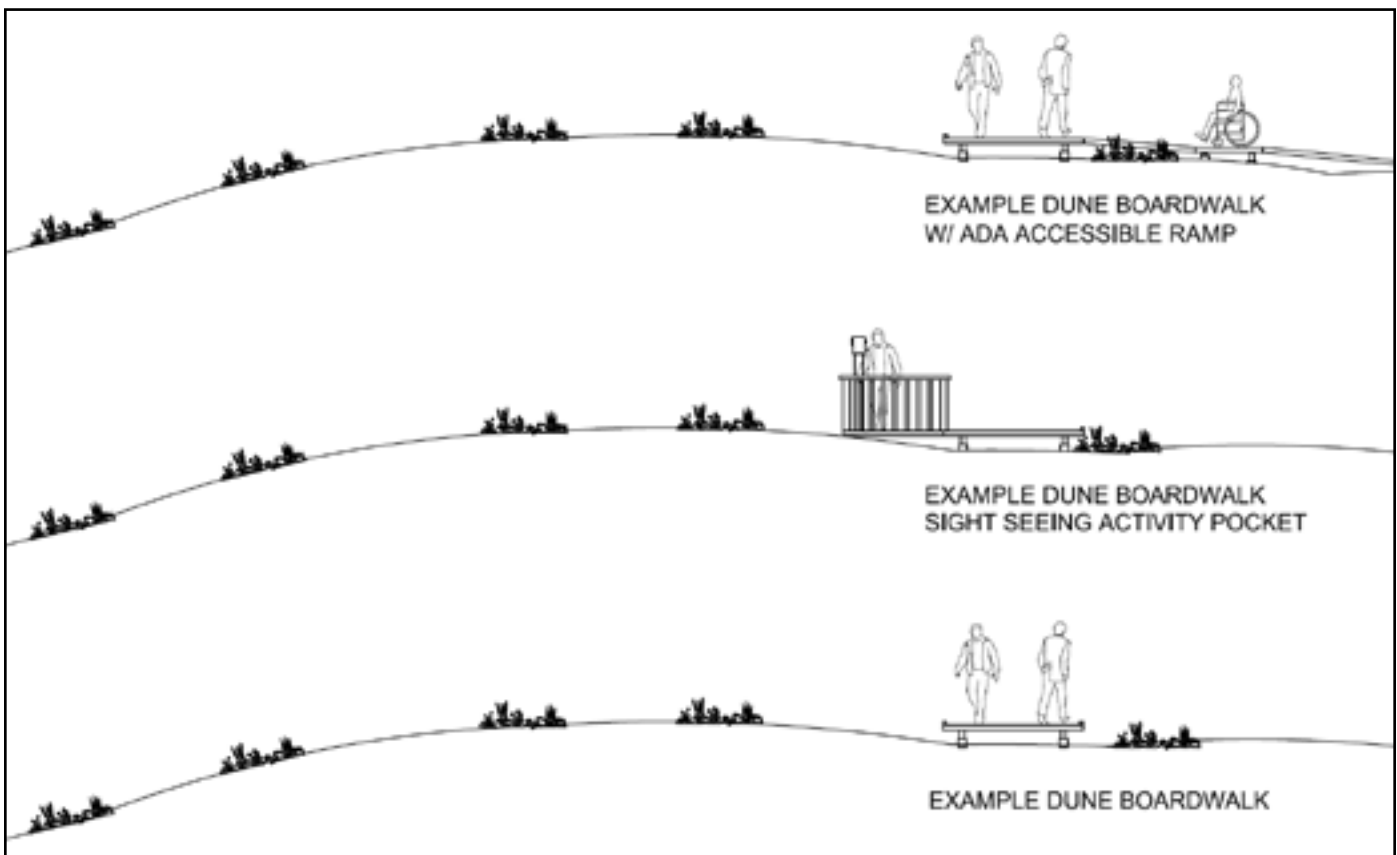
Example Cross-Sections of Embarcadero Dune Boardwalk (6.1.2.2.1)
